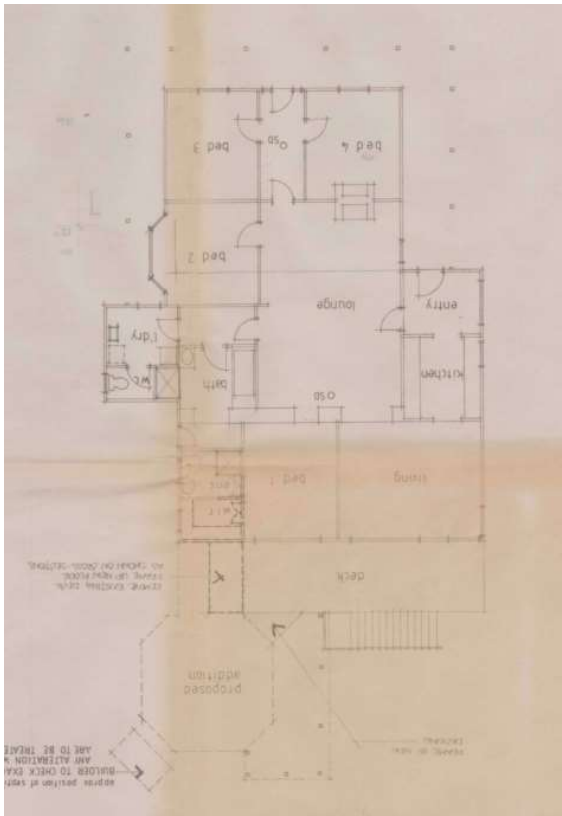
1992 plan for the rear tower (shown at the bottom of the plan in a dashed outline). The 1979 rear addition is also visible: Bedroom 1 with ensuite and walk-in-robe, Living room, and rear Deck. (Source: City of Ballarat, BP No. 34860)
